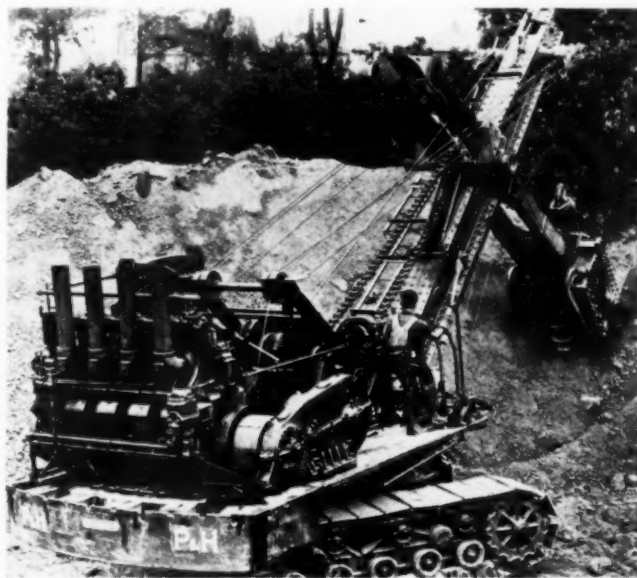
An excavator being powered by a 4-cylinder Diesel engine showing controls, engine mounting and drive, radiator, etc.
